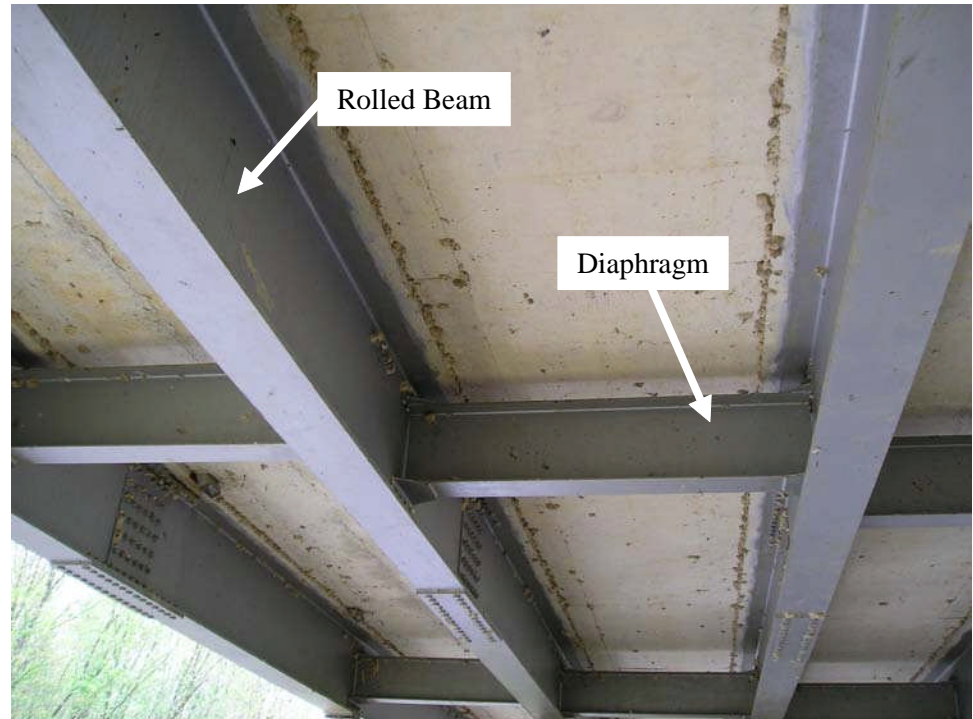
Rolled Beam (Primary Member) with Diaphragm (Secondary Member)
